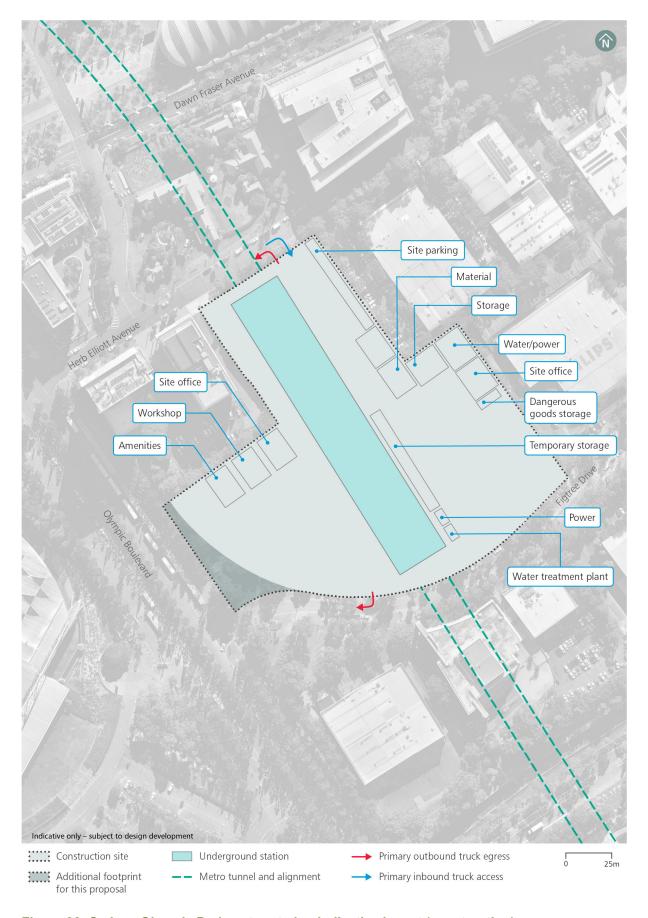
Sydney Olympic Park metro station indicative layout (construction)
